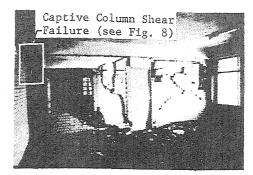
WALL DAMAGE AT TRANSVERSE FRAME
